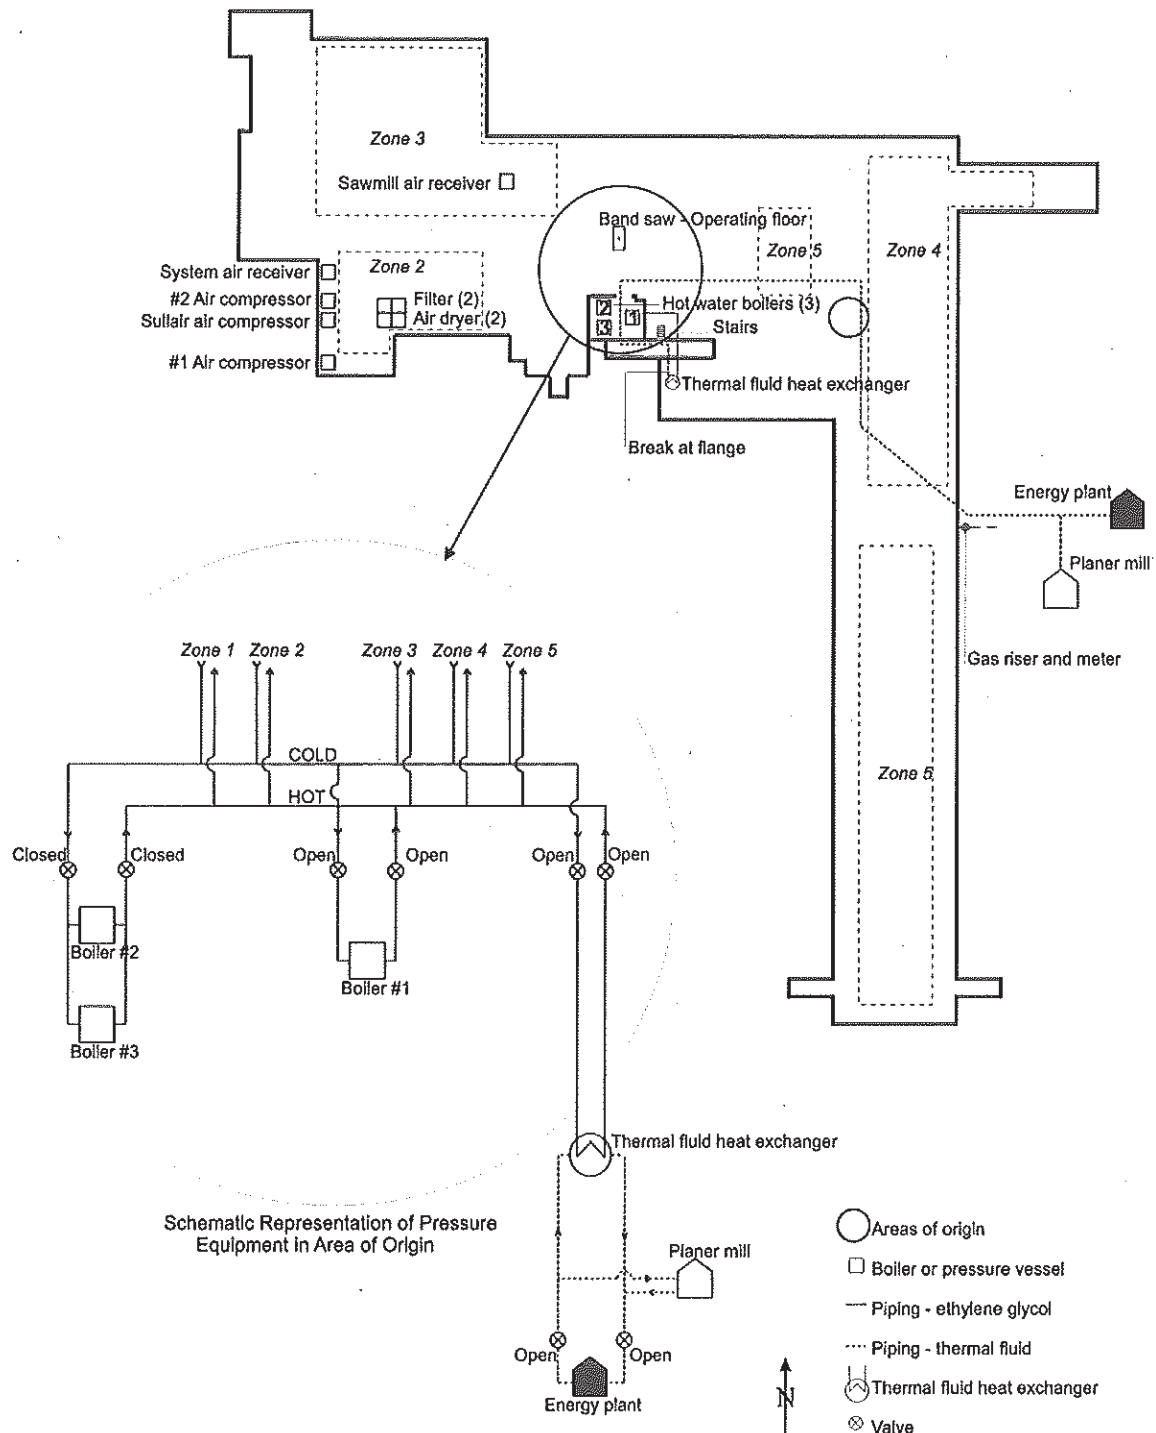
Plan view of mill - boiler and pressure vessel equipment
